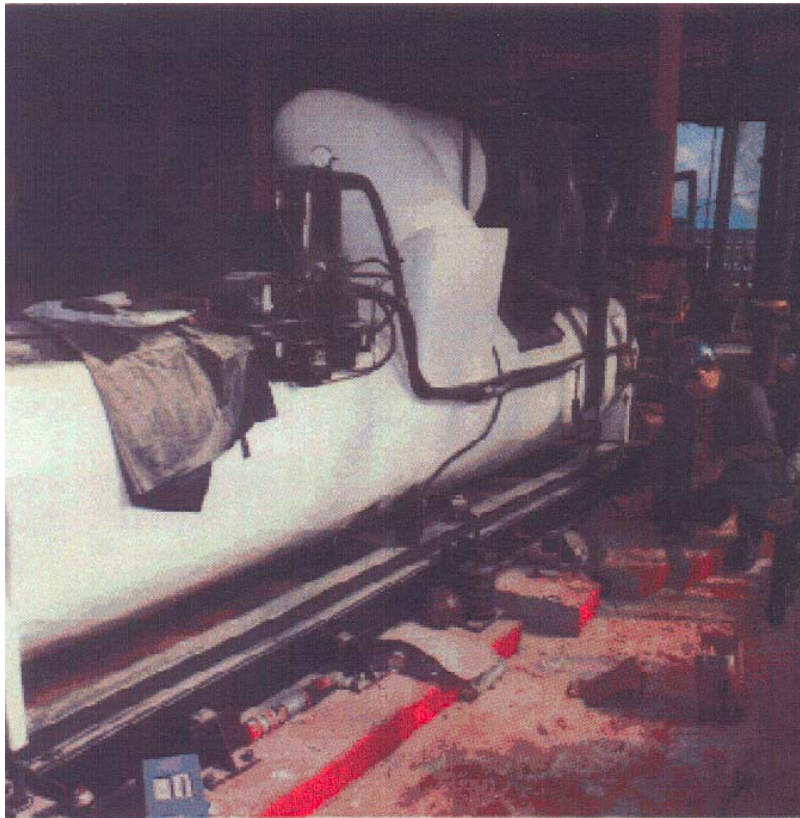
Failure of Concrete Pad (Mason Industries)
